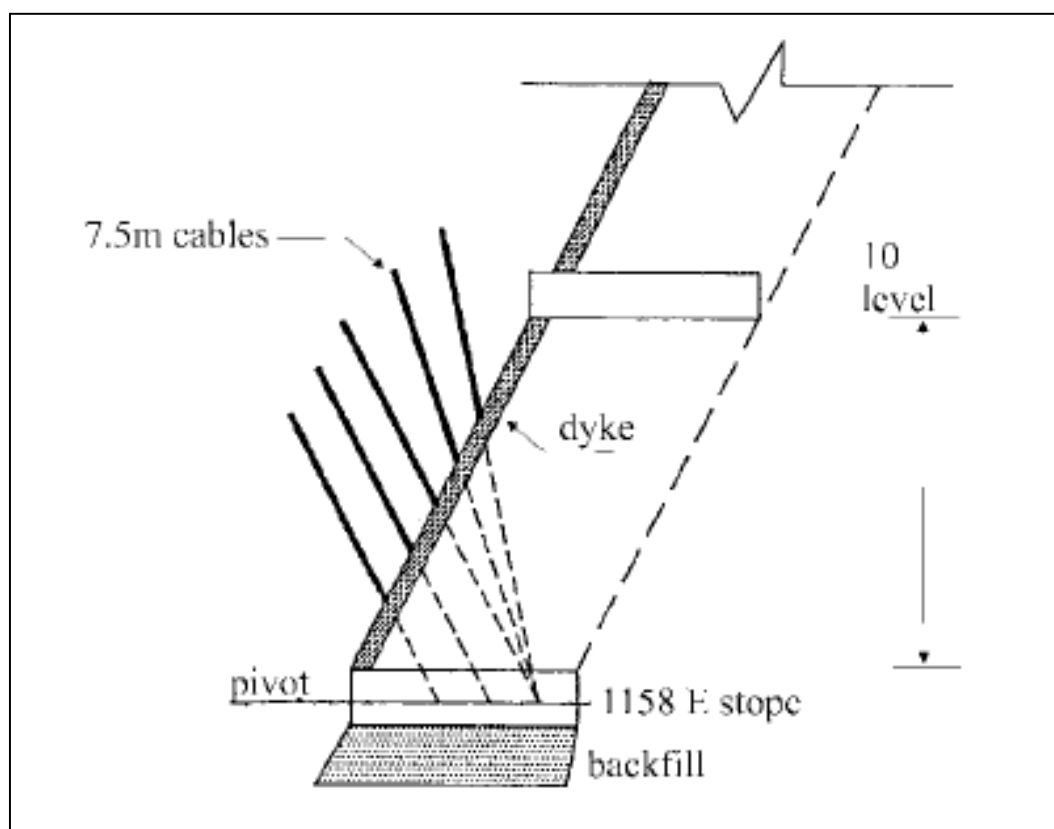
Support installation to support a dyke in hangingwall (Brady & Brown, 2006)
